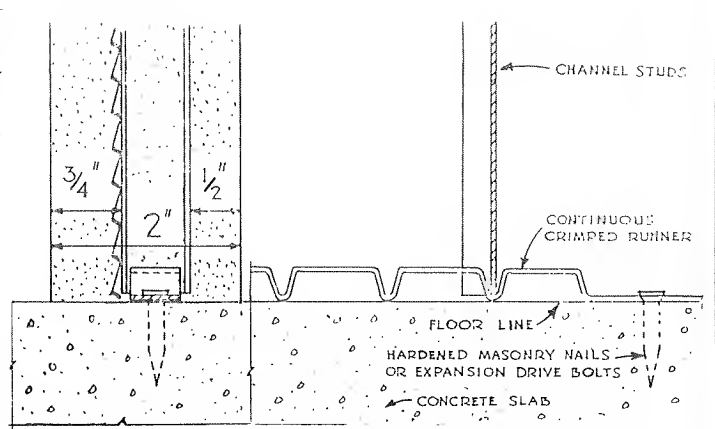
B. CRIMPED FLOOR RUNNER—18-gauge continuous crimped runners are attached to floor with masonry nails or equivalent anchors. Grooves in runner provide slot into which 3/4-inch channel studs are dropped. Top ends are secured as shown in Fig. 113-A at left.
